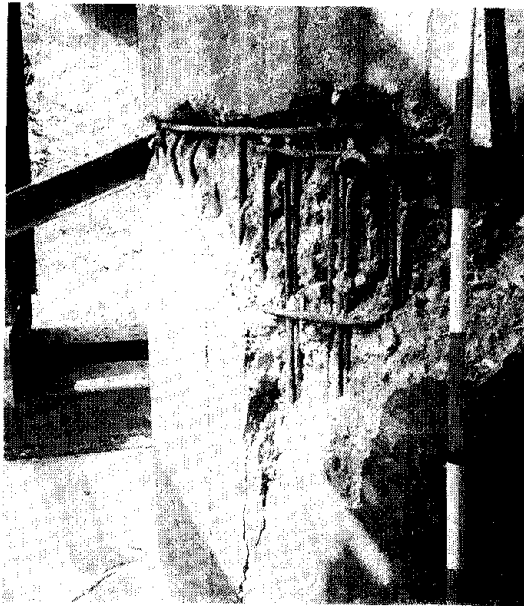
Damage of Pier P1 at Motouriya Bridge
